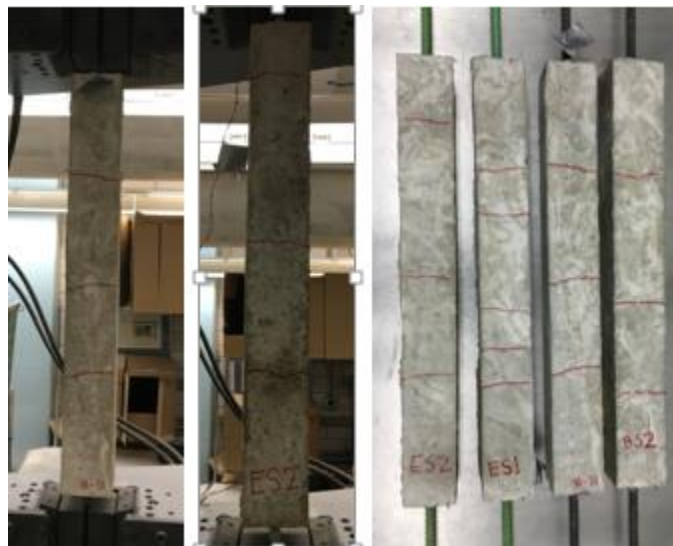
Testing of Slender Prisms (Left) and Cracked Specimens (Right)
